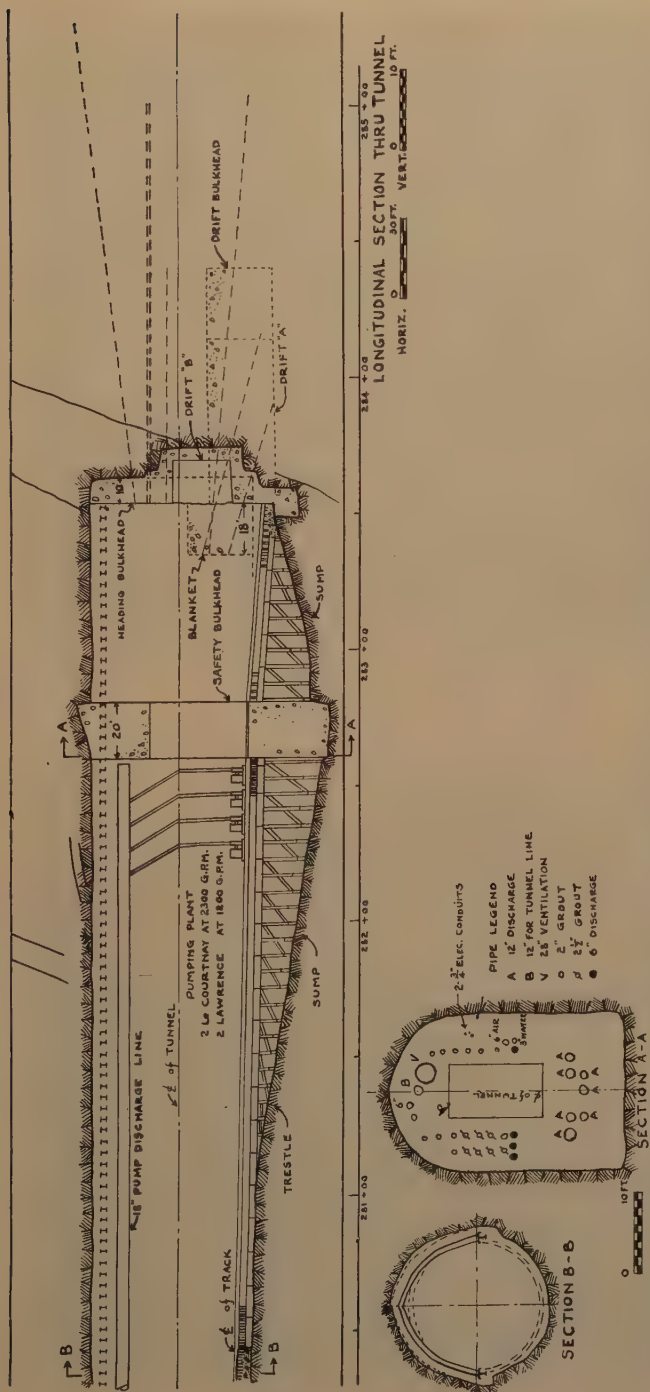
LONGITUDINAL SECTION THROUGH TUNNEL SHOWING LOCATION AND DETAILS OF DRIFTS, BLANKET AND HEADING BULKHEAD, SAFETY BULKHEAD, SUMPS, AND PUMP STATION.
